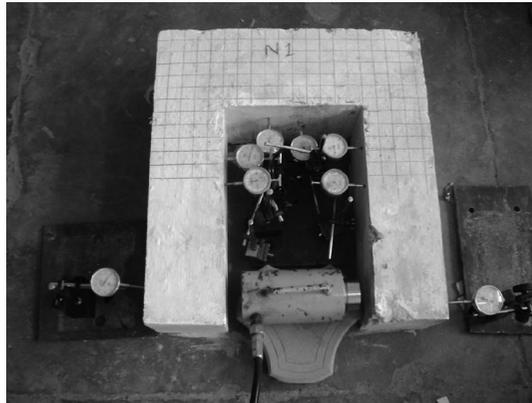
Showing shape and size of specimens, loading arrangements and instrumentation of the specimens.
